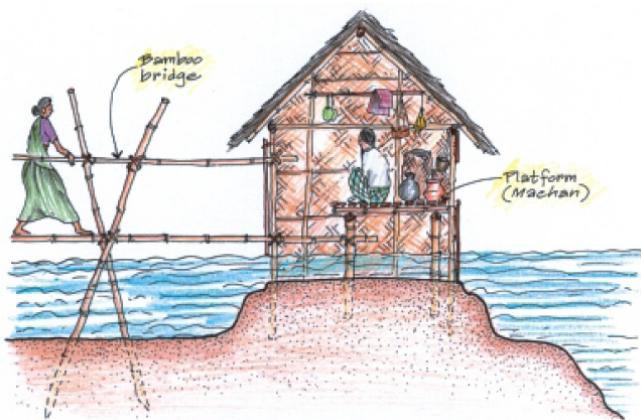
Bamboo house in flood-prone areas can have built-in wooden/bamboo platforms that normally are used as storage space, but during flood event serves as a raised refuge area.
